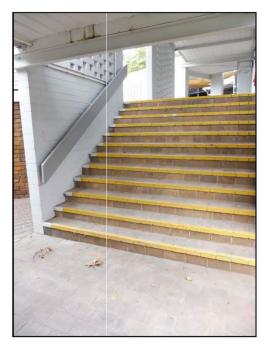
An existing entry to B101 and existing stair in the walkway between the building and B103.
